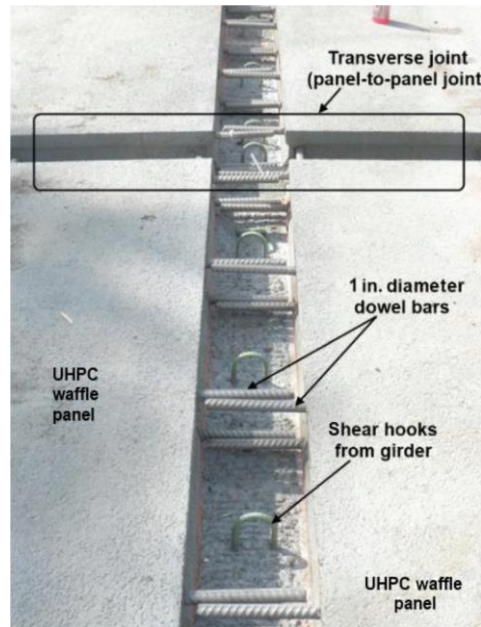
Shear key connection in Wapello County Bridge [62]
